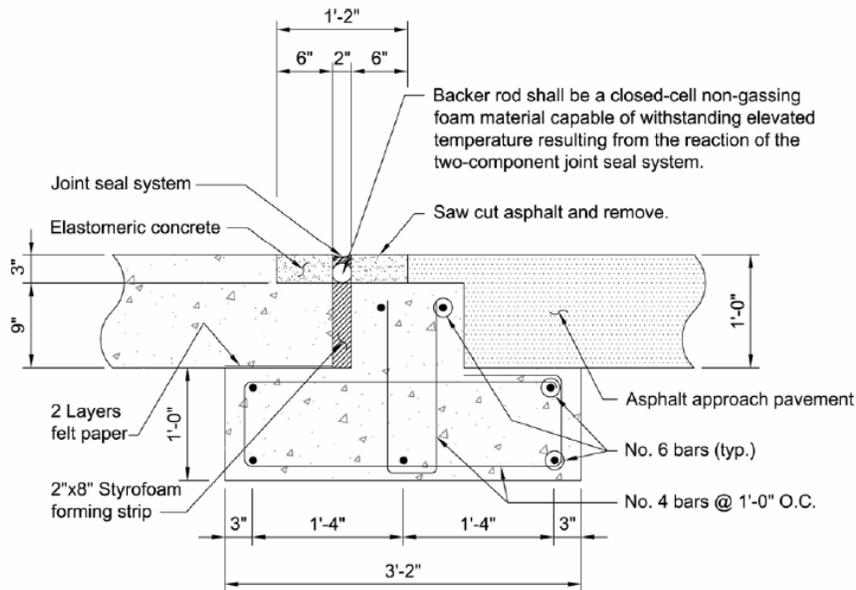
Suggested helper (sleeper) slab details. (Wasserman and Walker 1996)
